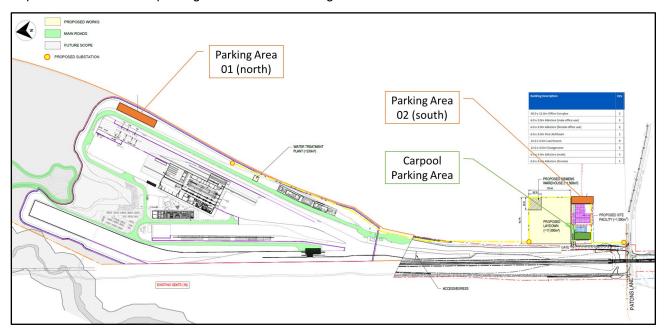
PROPOSED SITE ESTABLISHEMENT PLAN
